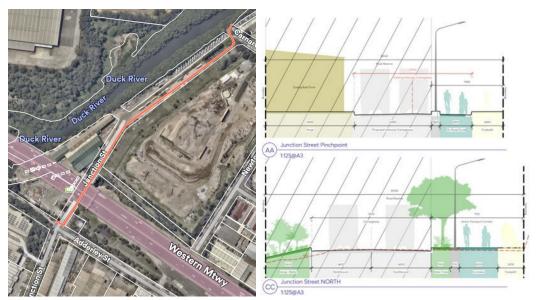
& 3: Location and indicative cross-sections of Junction Street.
